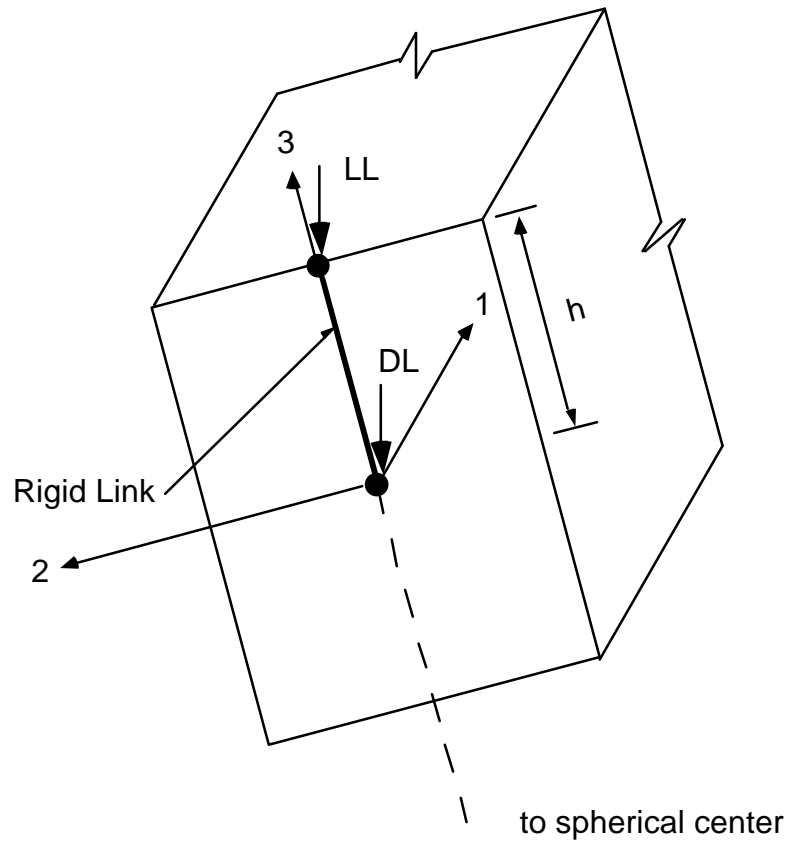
Beam Element with Live Load Applied to Top of Beam
